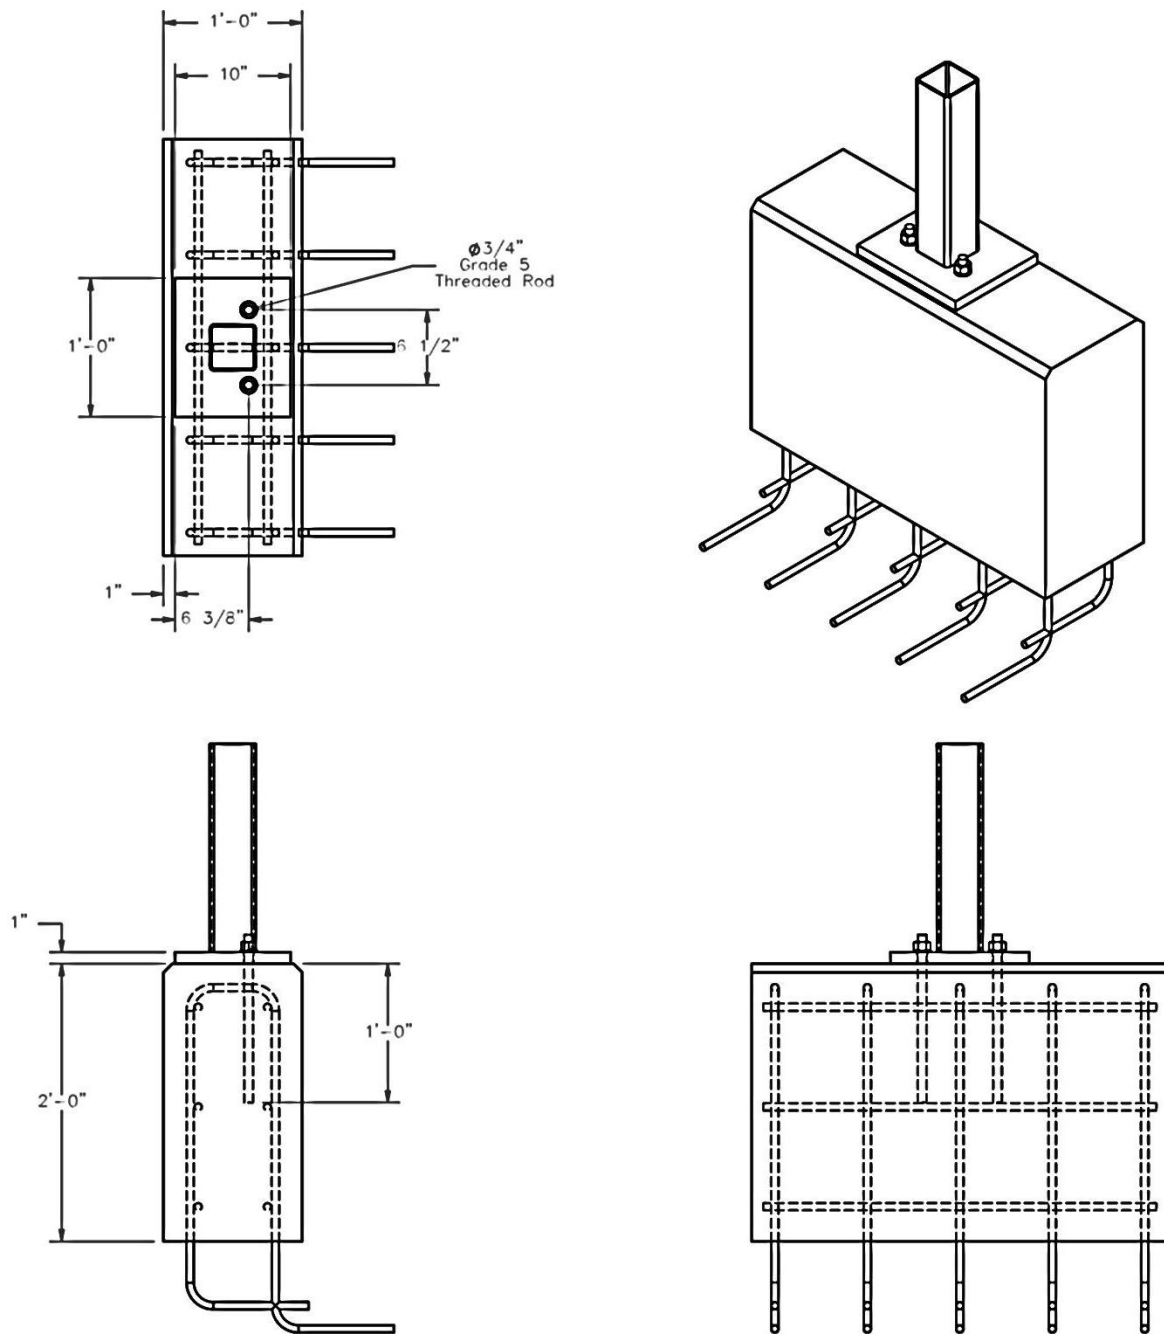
Two-Bolt Offset Alternative Anchorage Concept
